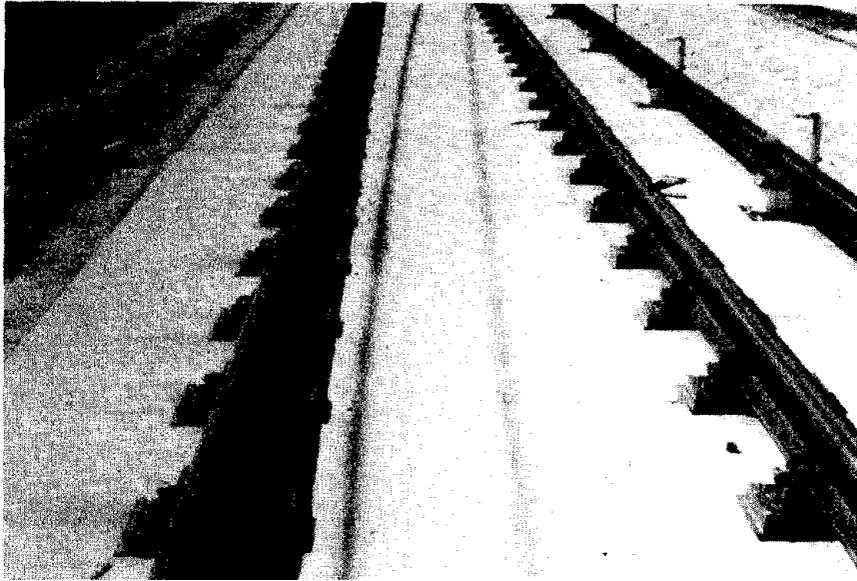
SLAB TRACK ON THE LONG ISLAND RAIL ROAD
